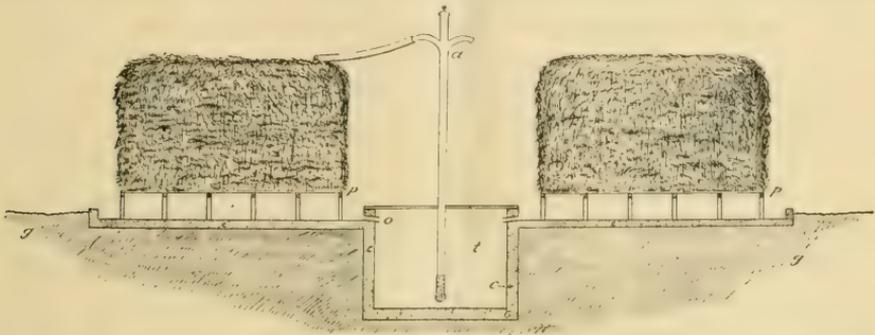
Imaginary cross section of an arrangement suggested for use where manure production is large. *a*, Pump; *c*, concrete floor and walls of cistern; *o*, outlet pipes leading from floor of maggot trap to cistern; *p*, platform maggot trap; *t*, cistern for liquid manure; *g*, ground level. (From Hutchison.)
